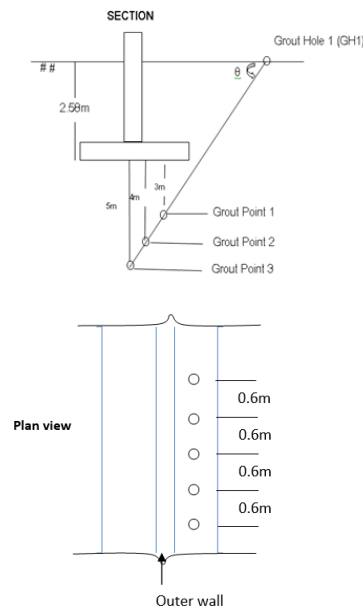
Schematic view of pressure grouting to be executed at the distressed site
